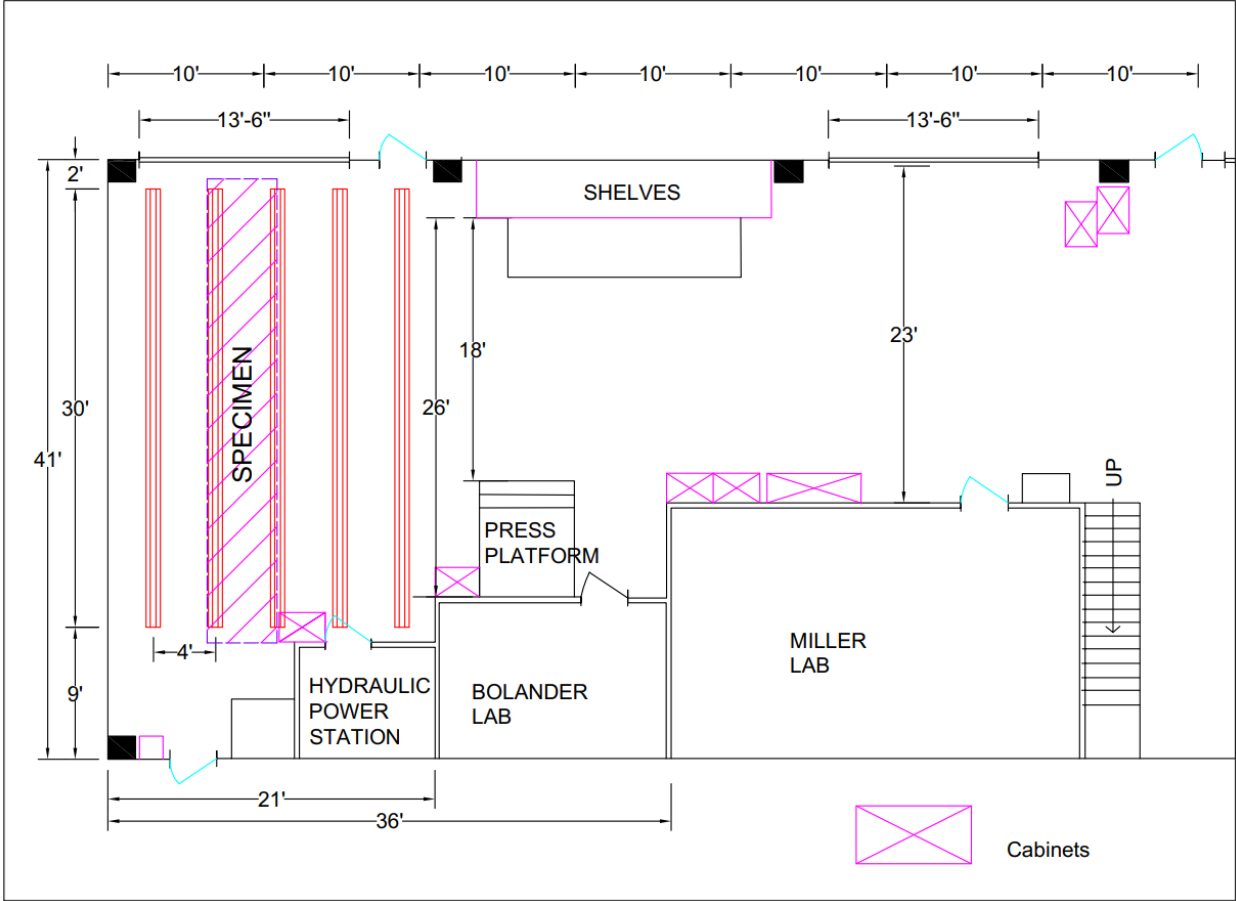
Structural testing facility at UC Davis showing strong floor on left
